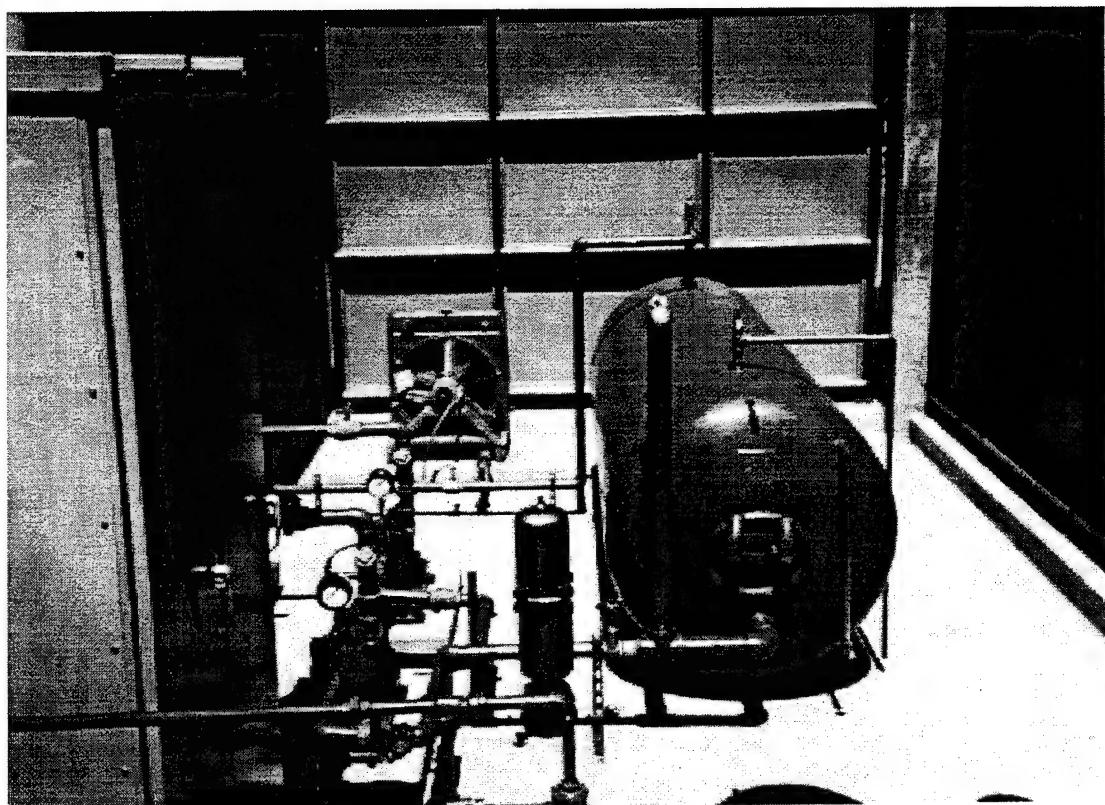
Auxiliary Machinery Equipment Pad (Water Side).
